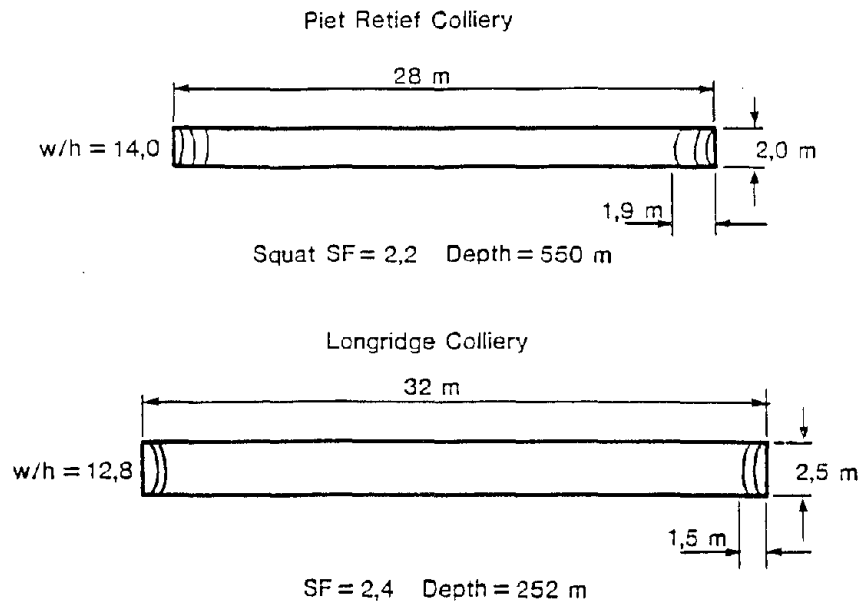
Sidewall Fracturing of Squat Coal Pillars.
